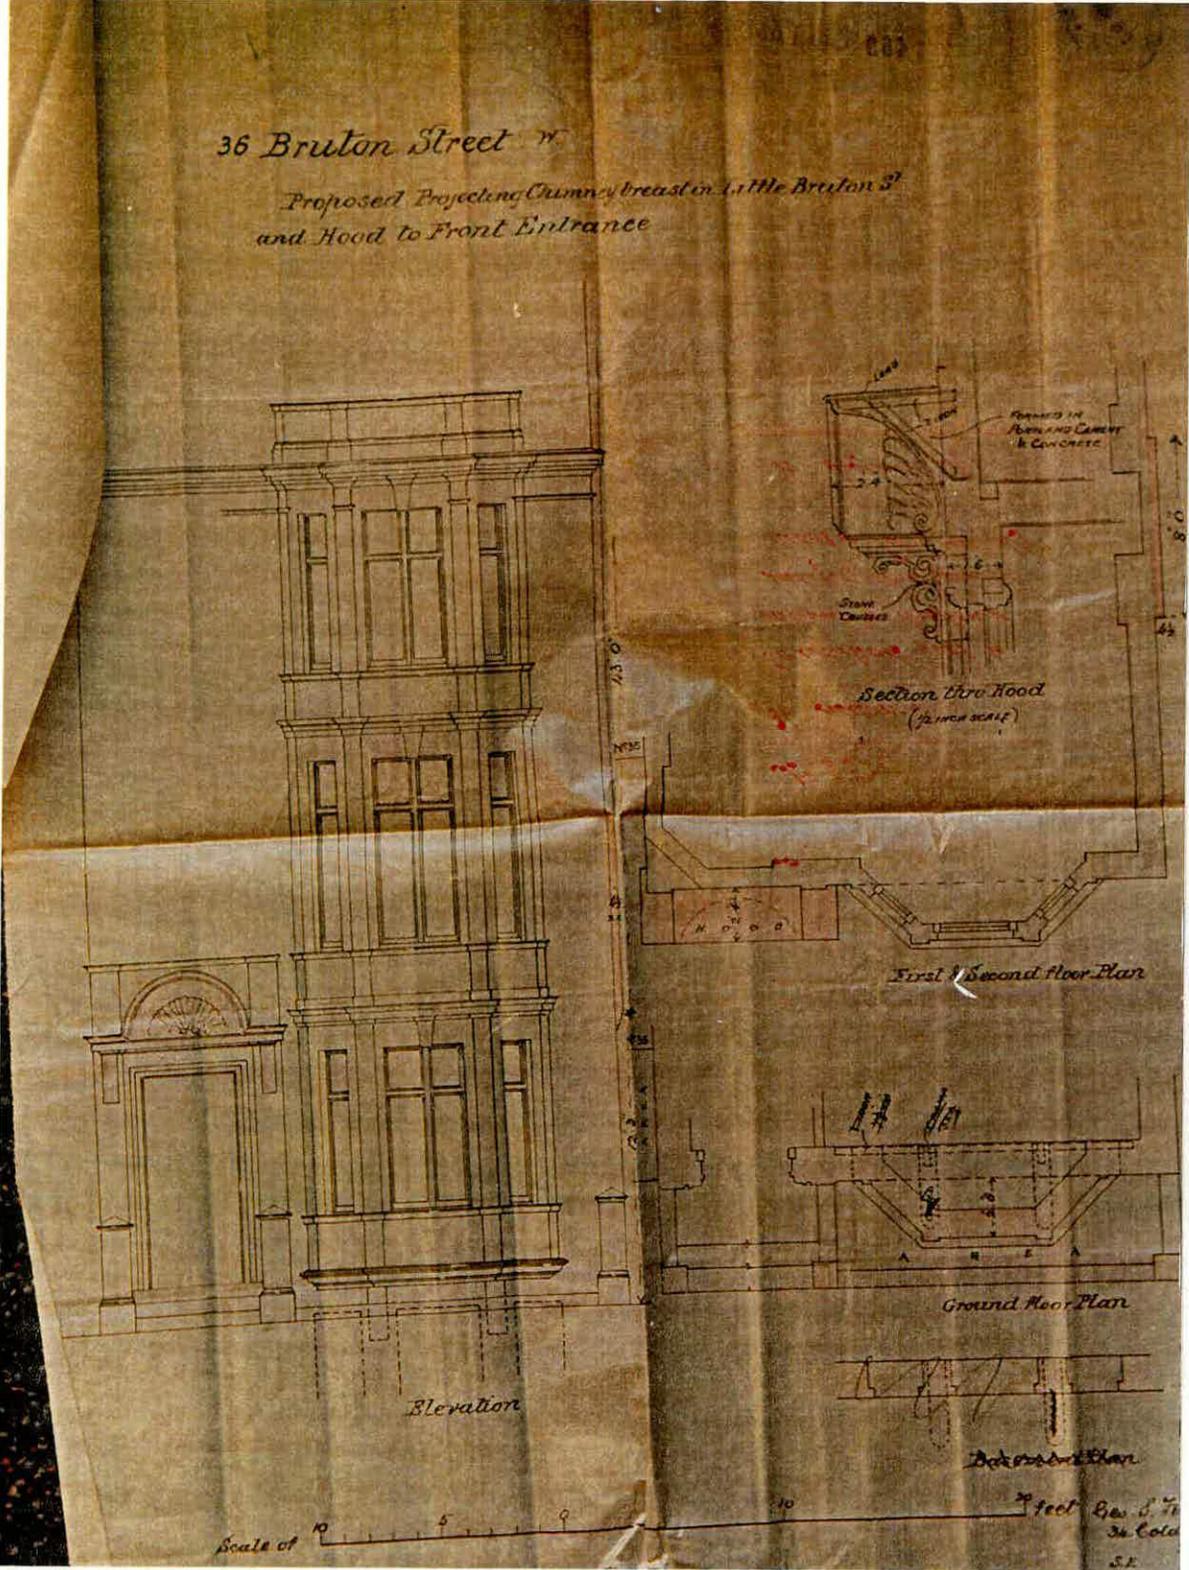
Detail of the proposed new elevation of No. 36 Bruton Street, by George S. Finlay, 1895 (City of Westminster Archive Centre, Surveyor's Department Plans, 468).
